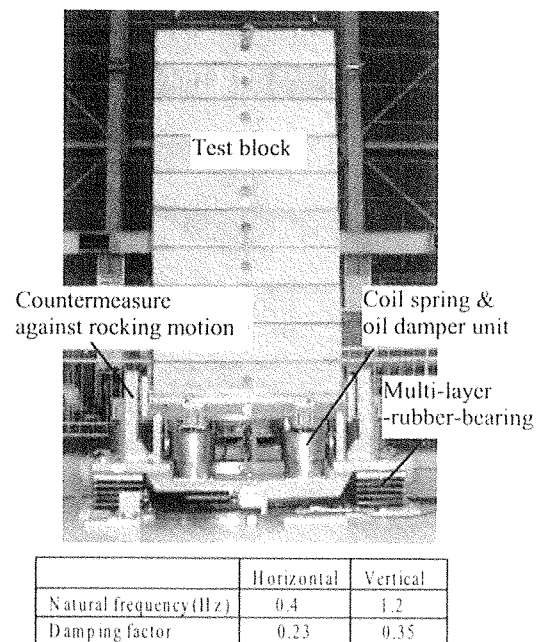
Three-dimensional base isolation test system using multi-rubber-bearings and coil springs
